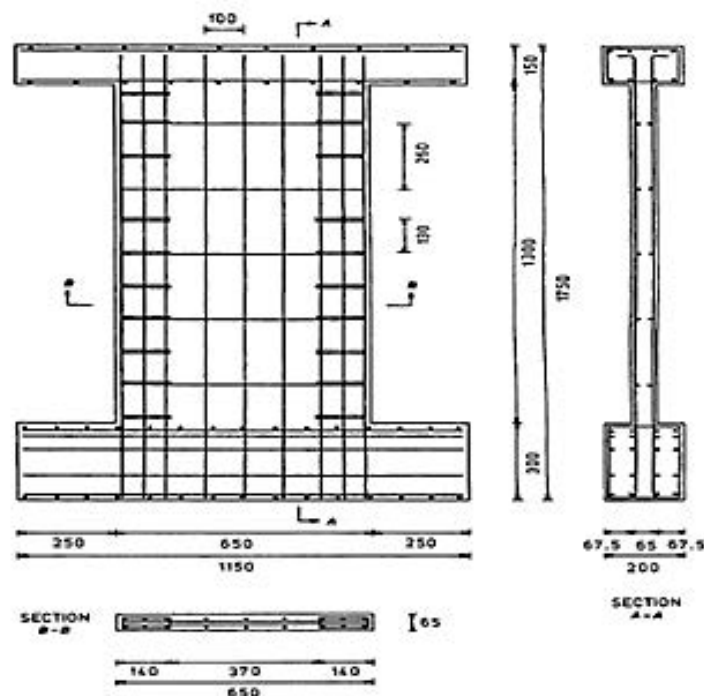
Geometric and reinforcement detail of the SW31 [17]
